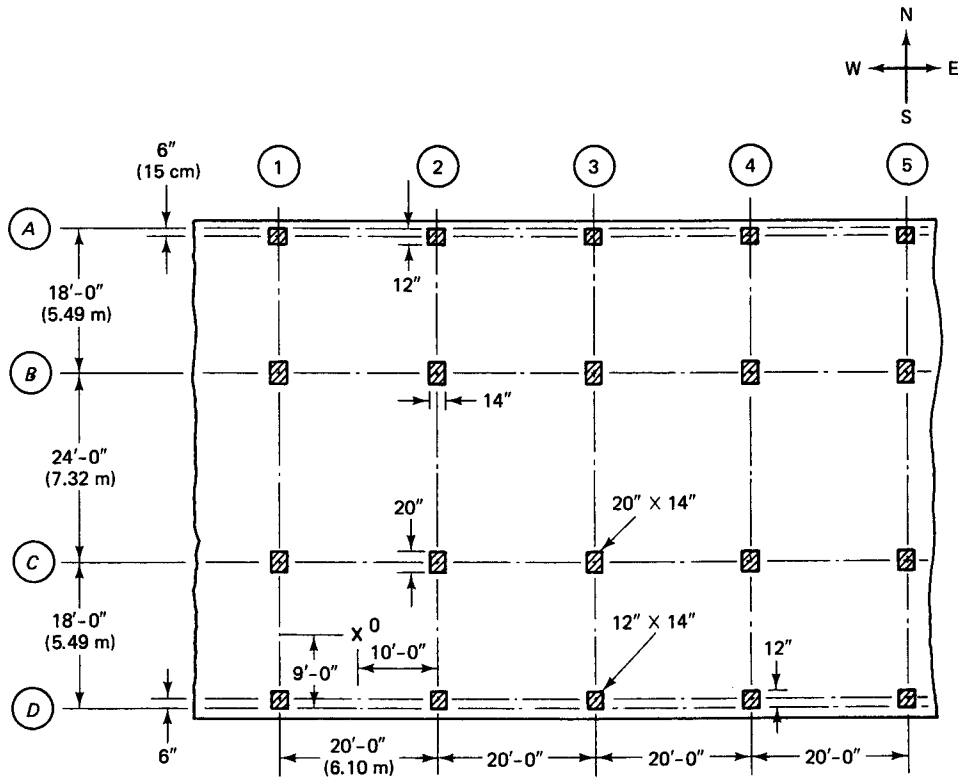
Two-way post-tensioned floor plan in Example 9.3
